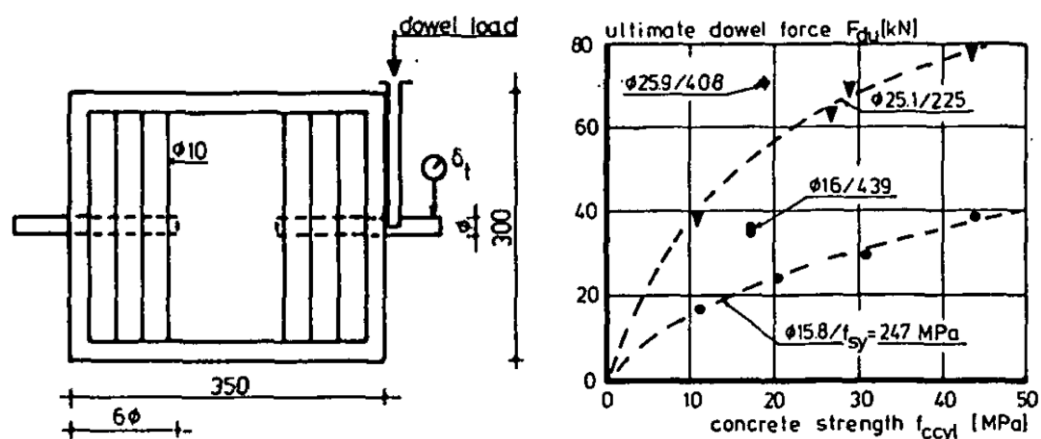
Test arrangement and results, Rasmussen [Ra1963]
